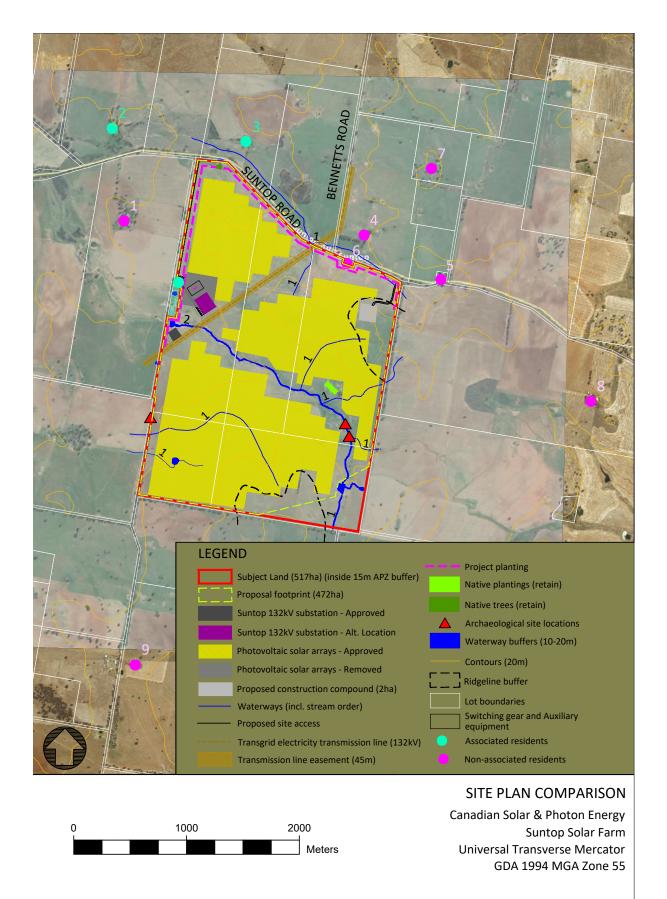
SITE LAYOUT PLAN SHOWING COMPARISON OF APPROVED AND PROPOSED SUBSTATION LOCATION
